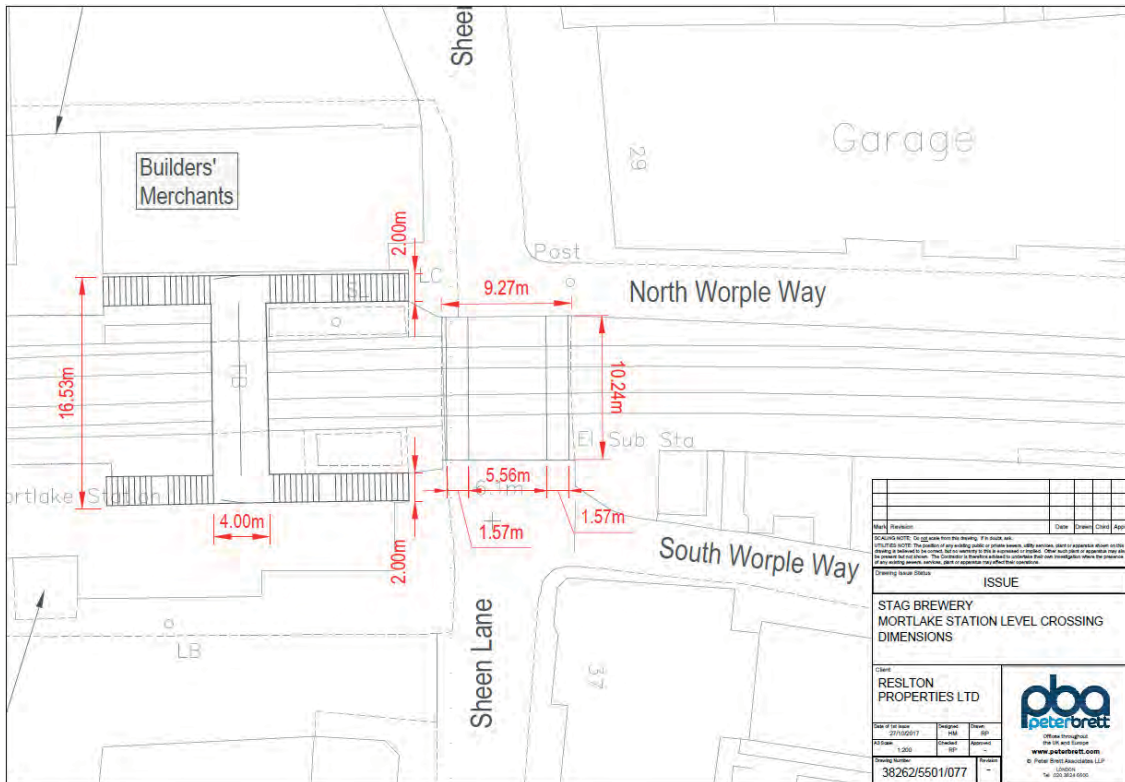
Dimensions of Sheen Lane Level Crossing and Footbridge
